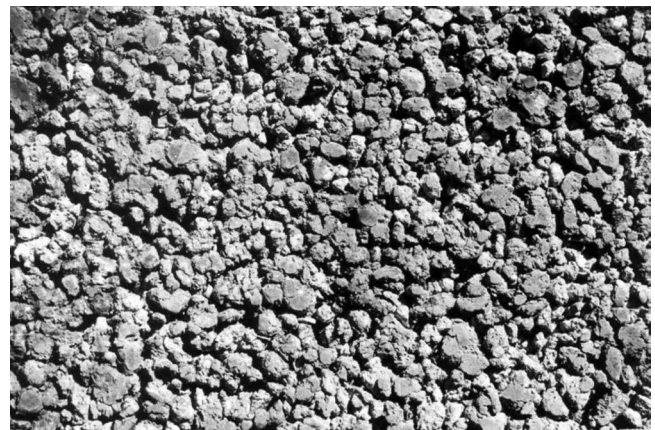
Pervious concrete pavement texture on parking lot.
